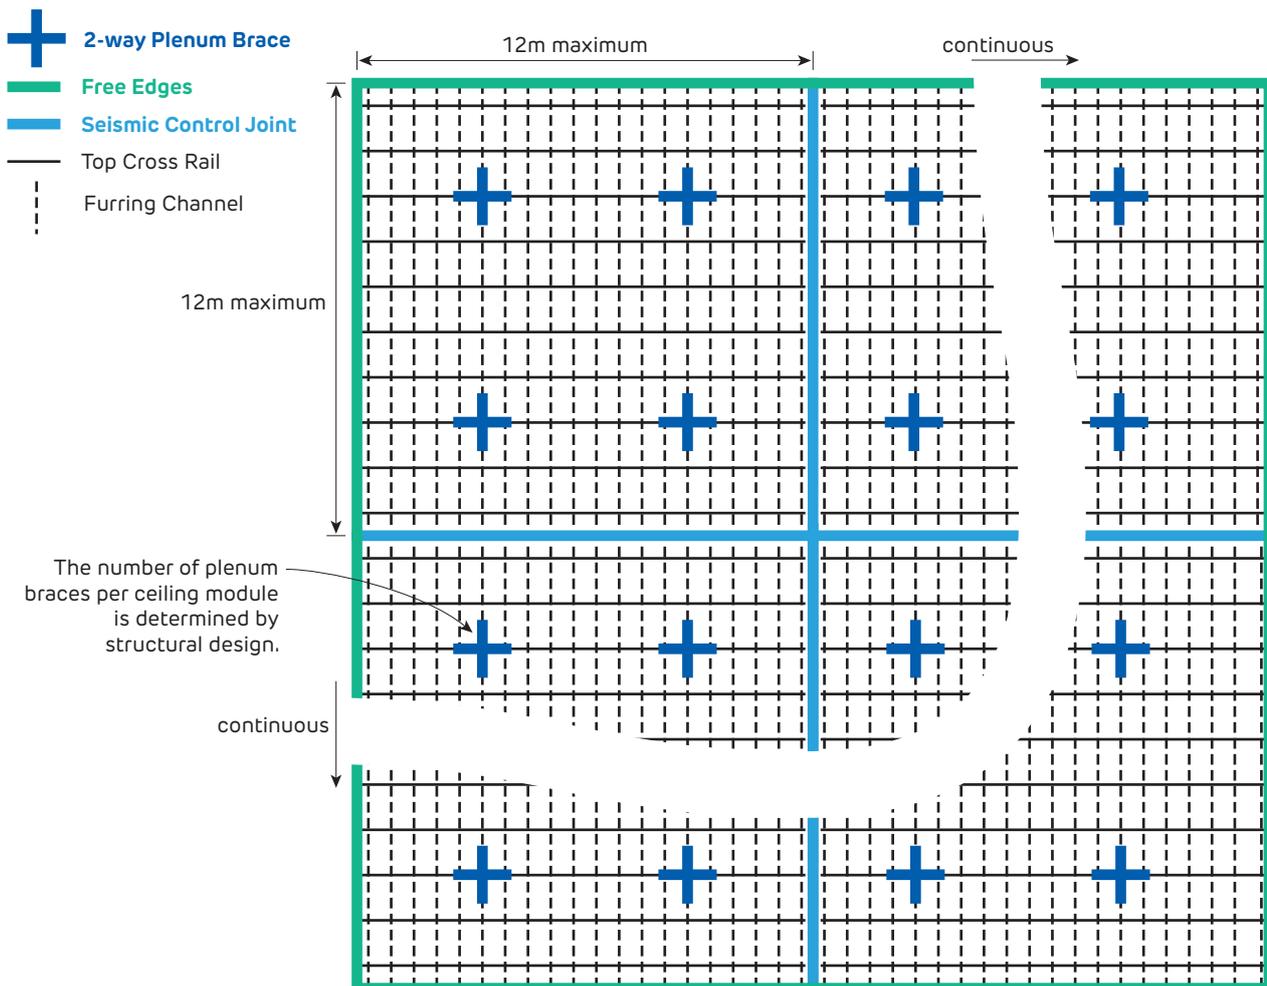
Suspended Ceiling - Type C, 2-way Plenum Braced
